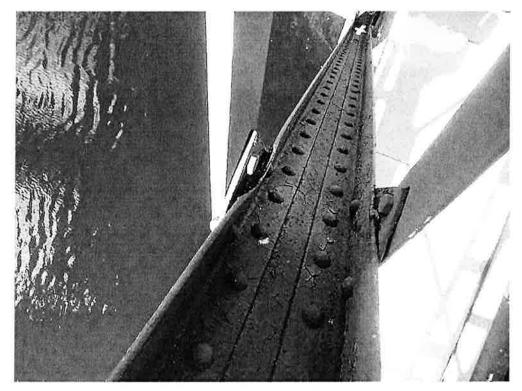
South tower inner truss, member U4-L2 at M3 – outer flange has section loss at the edge.
